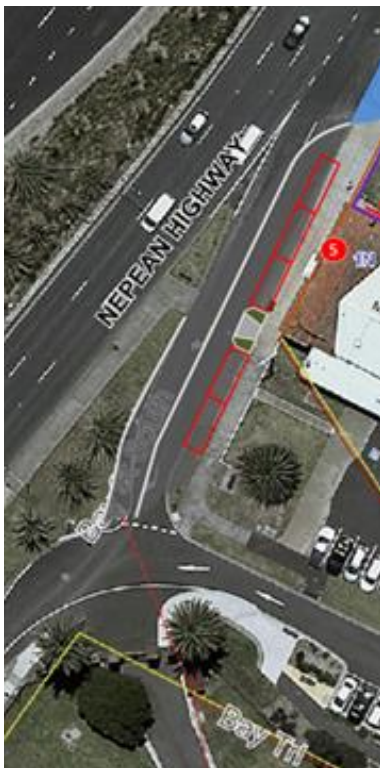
PROPOSED PARKING SPACES ON BAY LANE SOUTH
